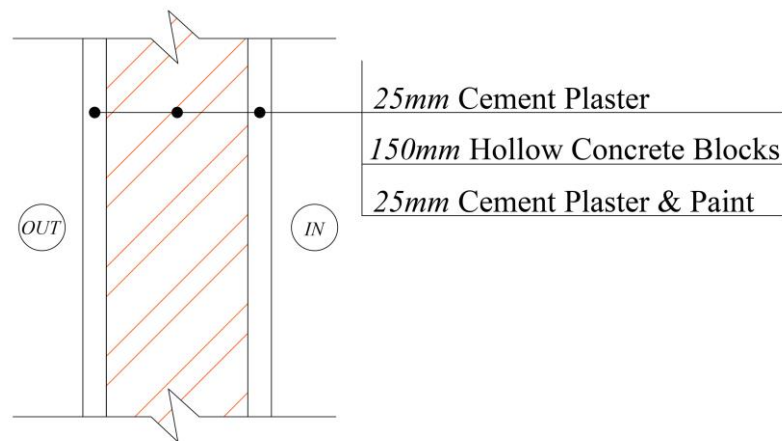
Schematic cross section shows dominant external wall configuration found in surveyed apartments, Type-A (not to scale).
